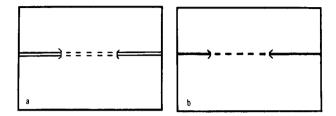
Railroad Overpass, Underpass. (a) Railroad overpassing road. (b) Railroad underpassing road.
